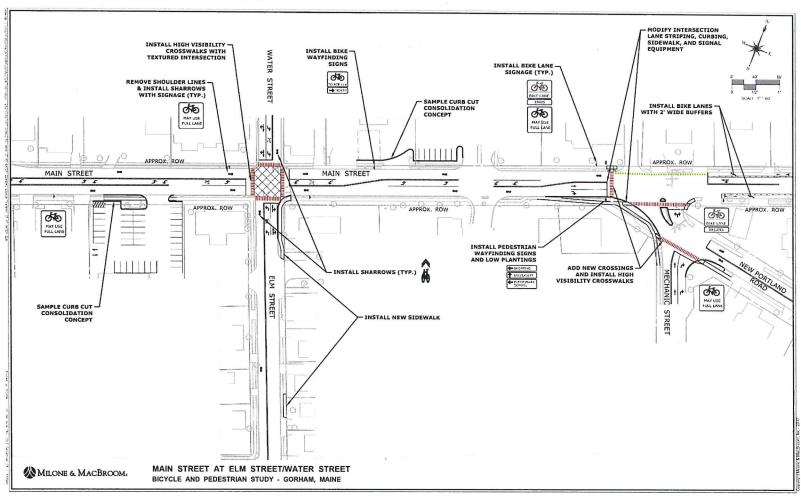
Concept plan showing improvements at along Main Street near Water Street / Elm Street and Maine Street and New Portland Road / Mechanic Street.
